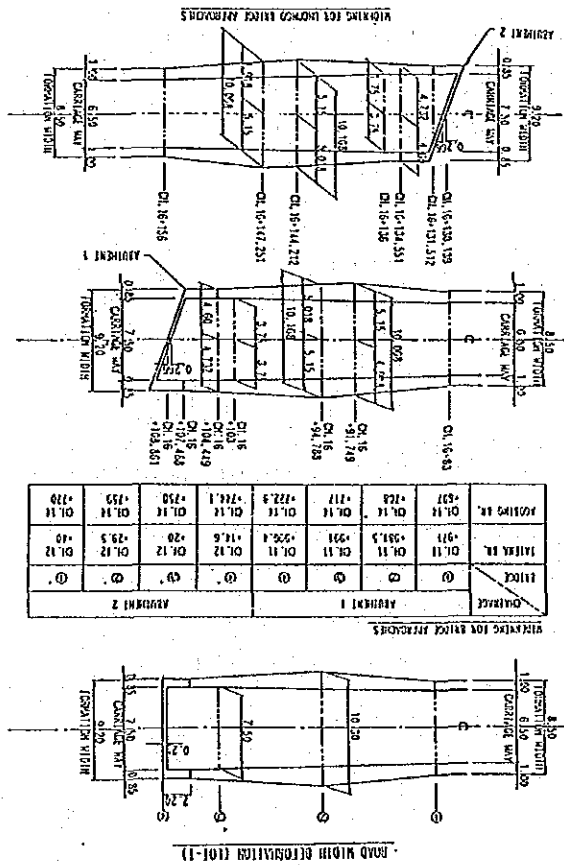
LOT-11 Pavement Section and Point of Road Width Change
